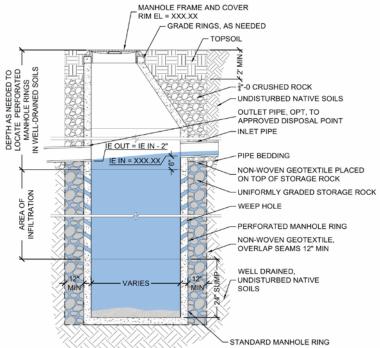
Typical drywell detail in landscape area. This includes an optional sub-surface outlet pipe for large storms when excess runoff volumes could impact nearby infrastructure if water backed up to the ground level. This assembly, with a manhole lid at the surface and piping into the sides is recommended to improve and ease maintenance access. Note that this recommendation conflicts with the requirements of the 2014 Oregon Plumbing Specialty Code, "Chapter 11 Storm Drainage"⁷¹; however," Section 301.4 Alternative Engineered Design" in Chapter 3⁷² allows for alternative designs that meet the intention and function of the code when signed and stamped by an Oregon registered Professional Engineer (P.E.) and approved by a Building Official.
